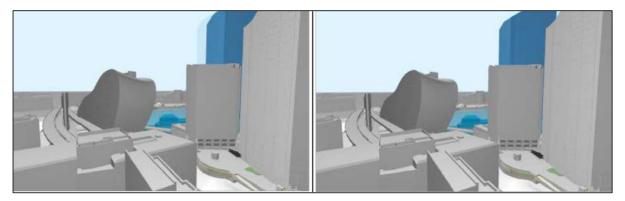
| 60 Bathurst Street north-western view from a mid-tower location (RL 57.2) towards Darling Harbour and the site. The indicative tower in a northern location (left) and southern location (right) (source: Applicant's RtS)
